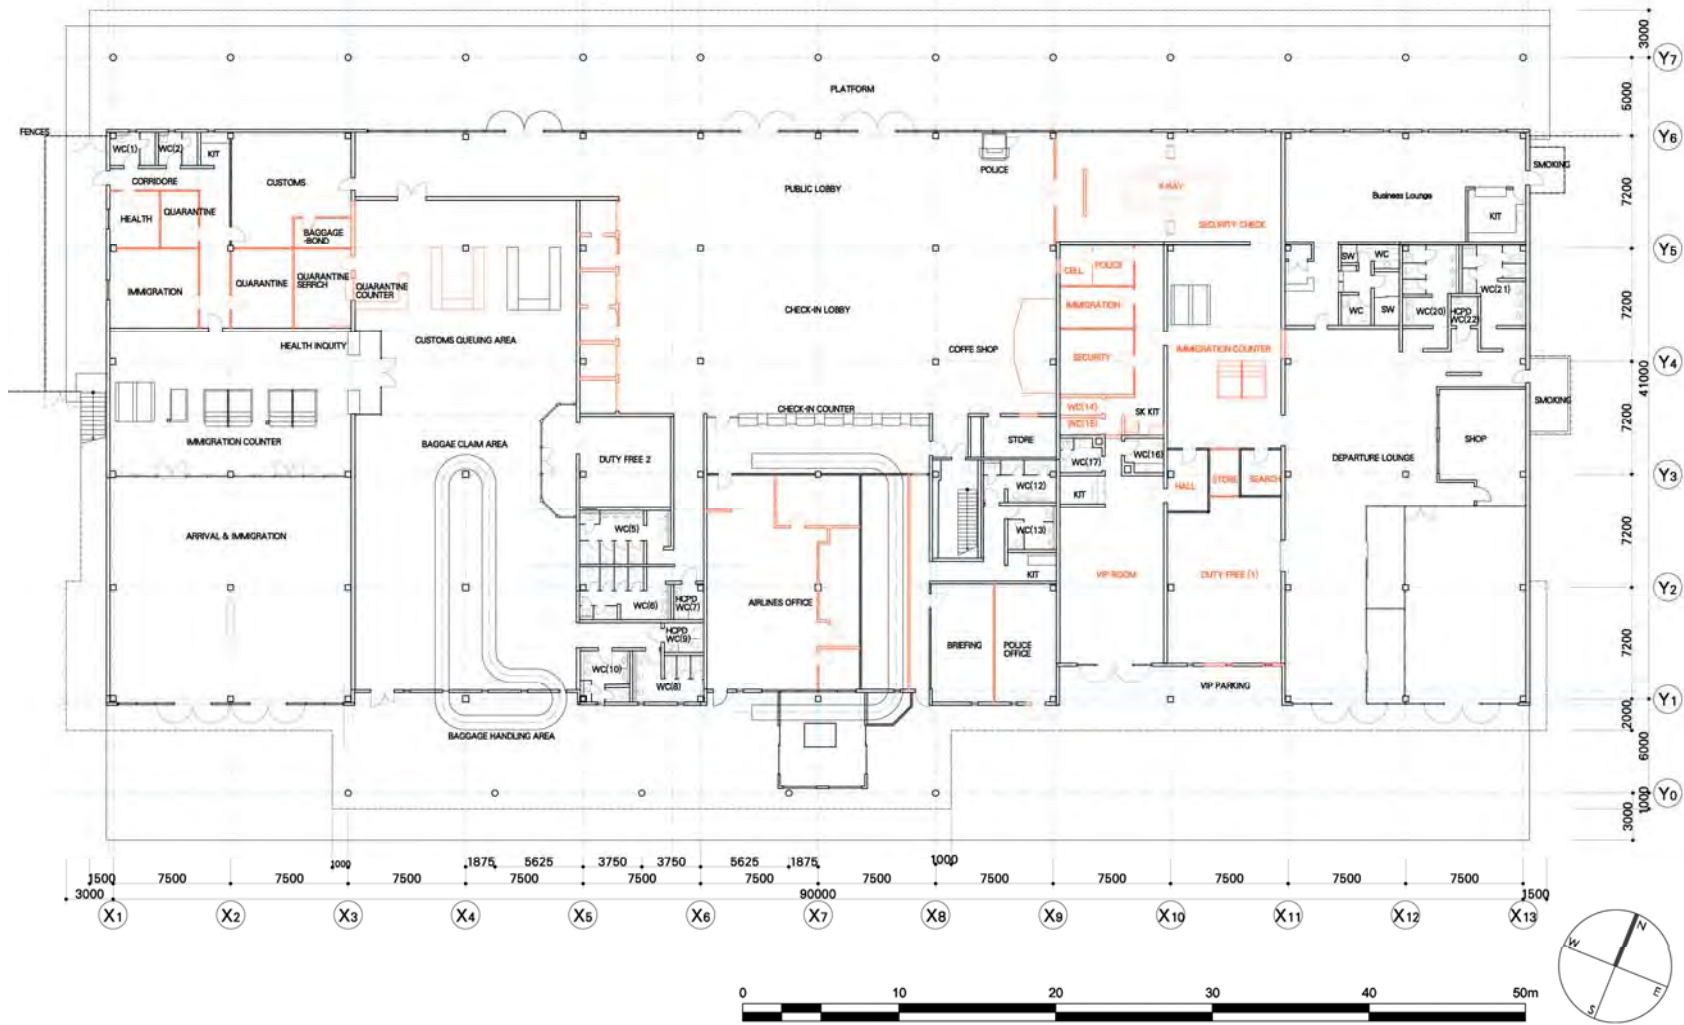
Ground Floor Layout Plan (ETB) (Red line indicates removal of partitions)
